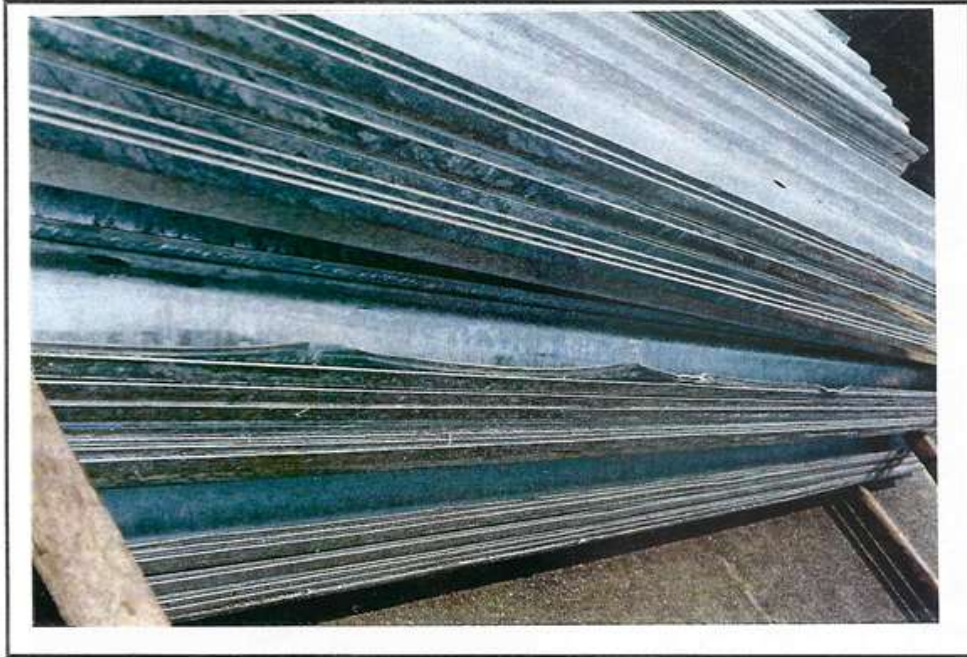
Condition:* Bent Rail (Cracked or Broken Galvanization)
